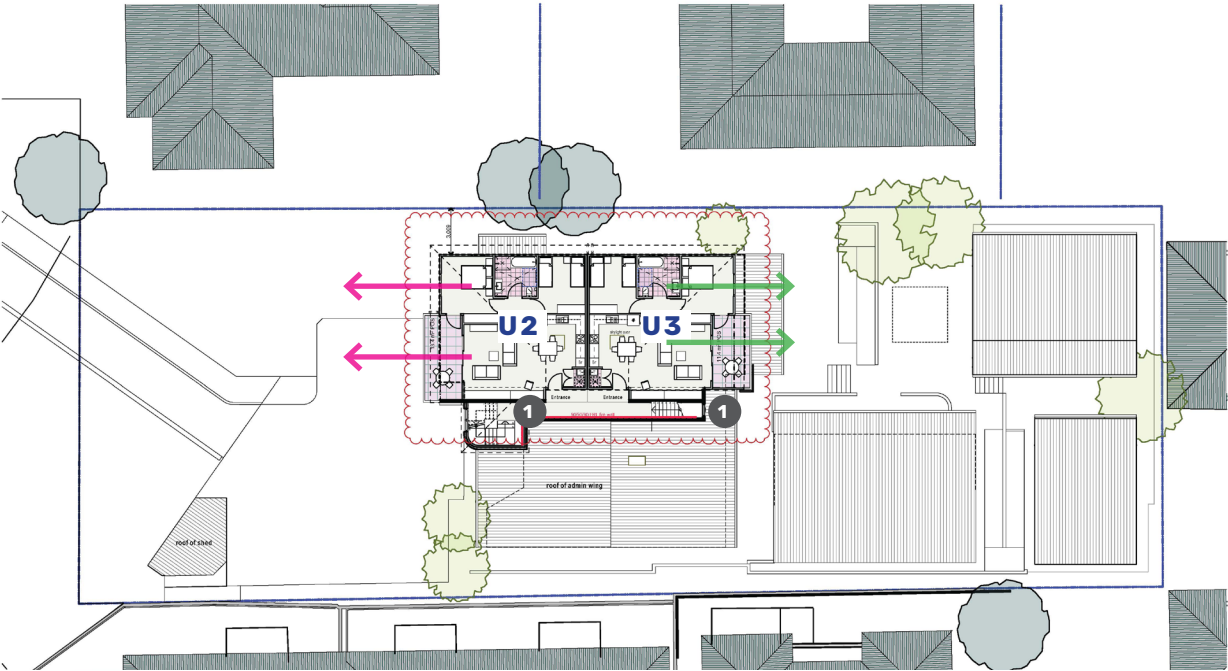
Summary Crime Prevention Assessment - First Floor Plan (Housing Plus/TDP 2024).
